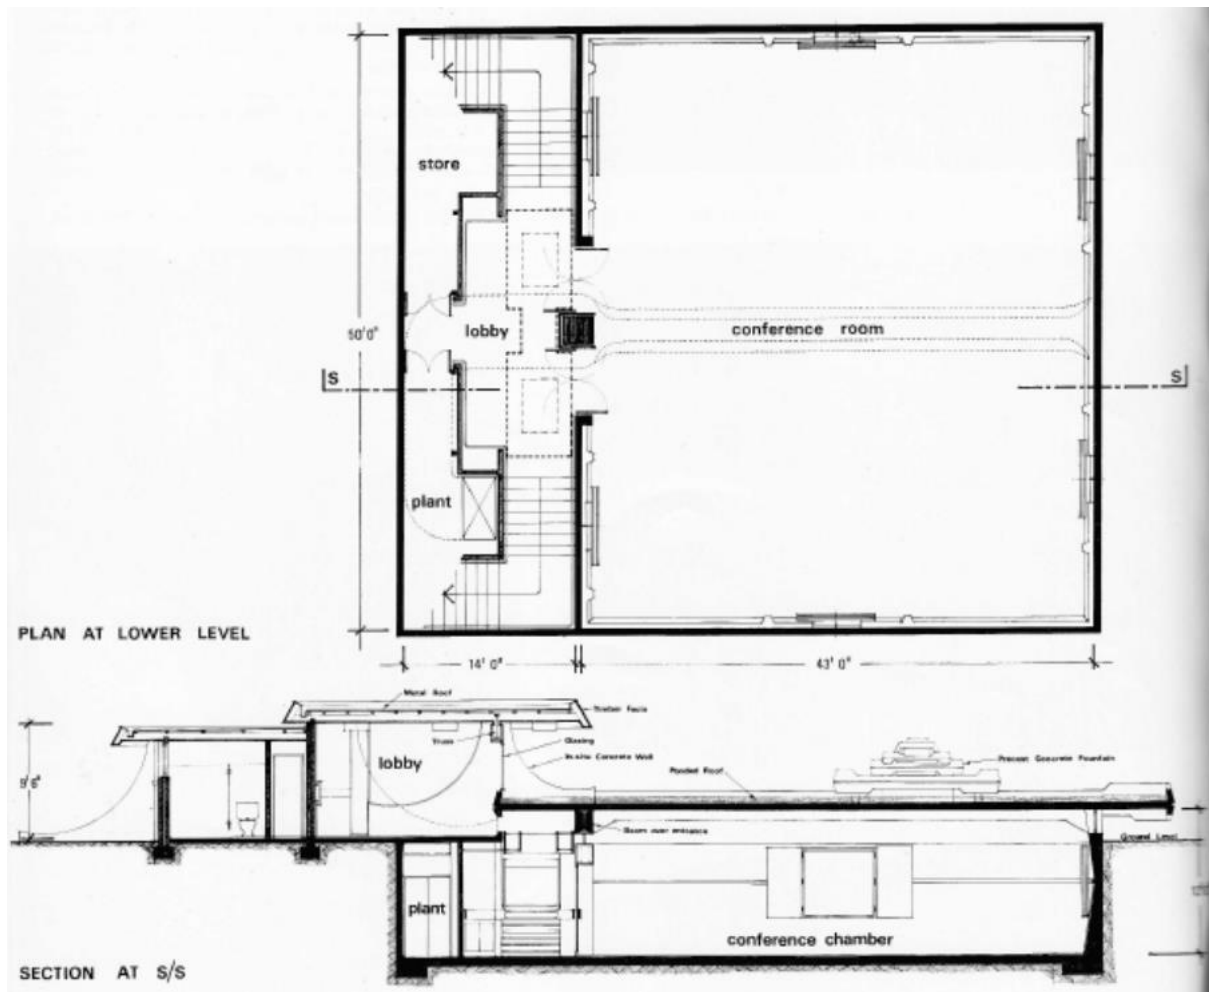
Original lower level and section plans (from *Architecture in Australia*, 1968:1109)
